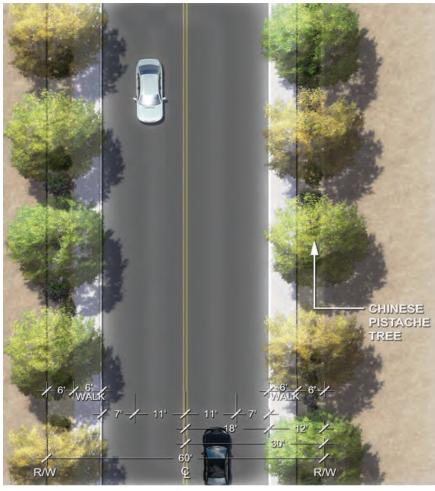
| Themed Road(s) - H Plan (60' R.O.W.)
